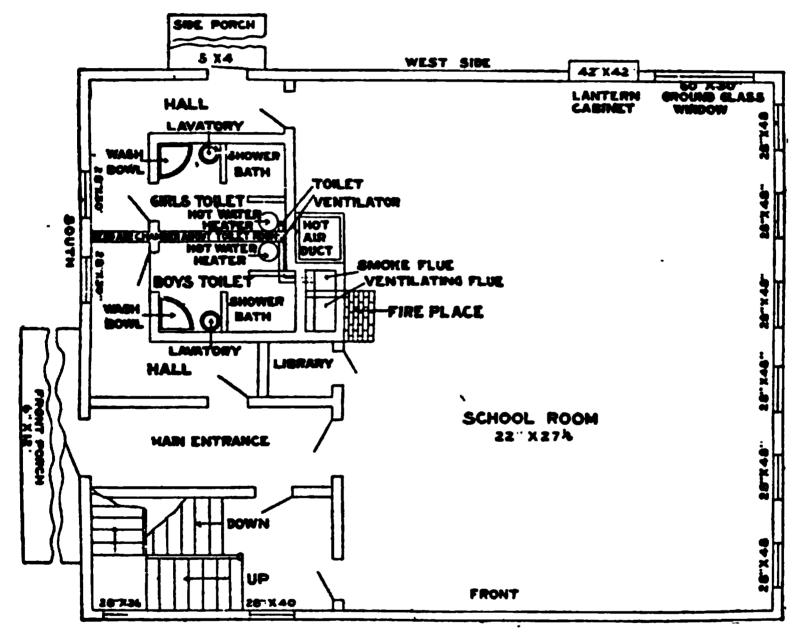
First floor plan, model rural school, Kirksville, Mo.
